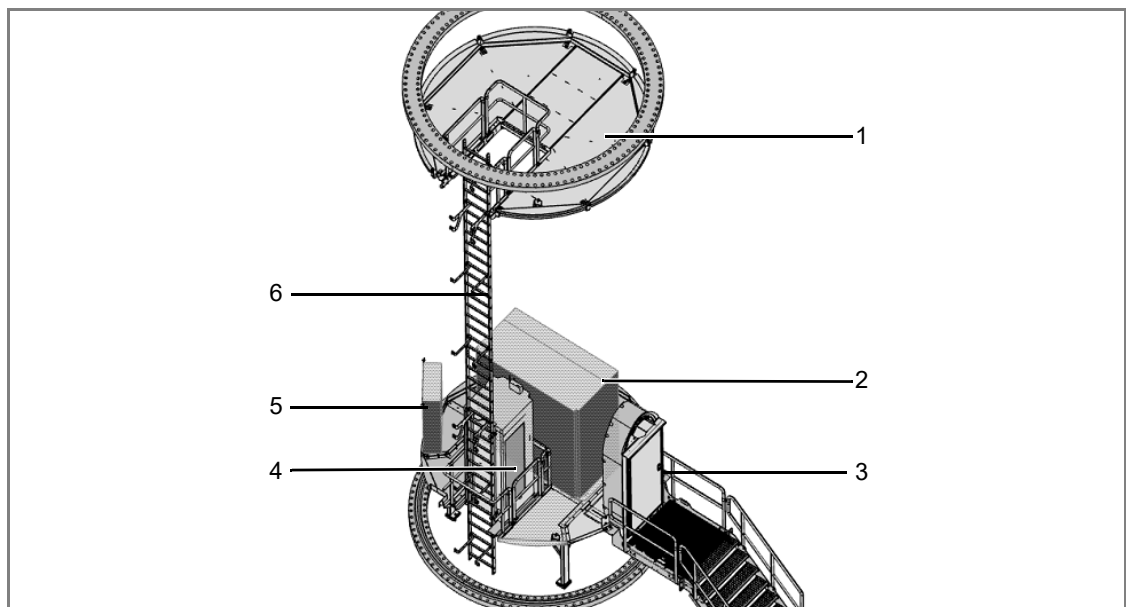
Overview of installations in the bottom section of the steel tube tower with a vertical ladder (in case of a step ladder different image)
